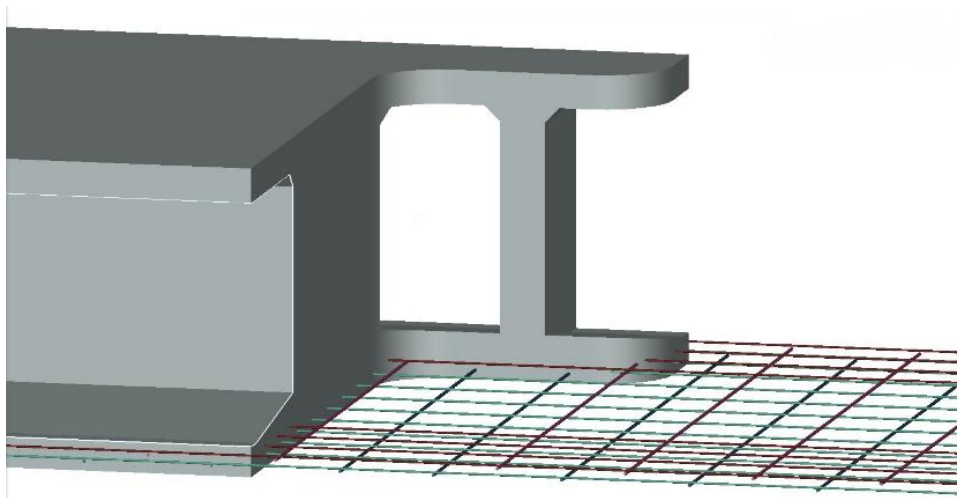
Integral Bent Cap Bottom Slab Reinforcement
